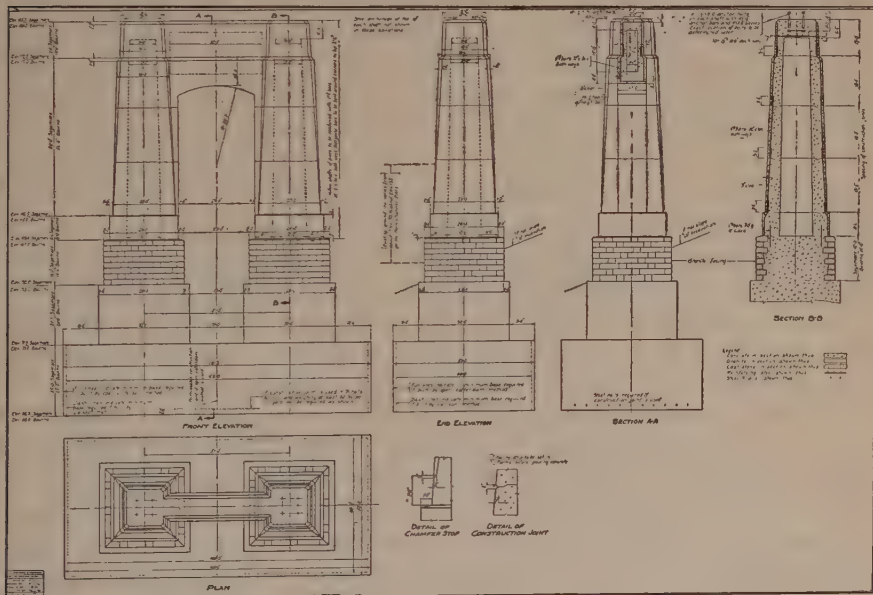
MAIN CHANNEL PIERS OF HIGHWAY BRIDGES
